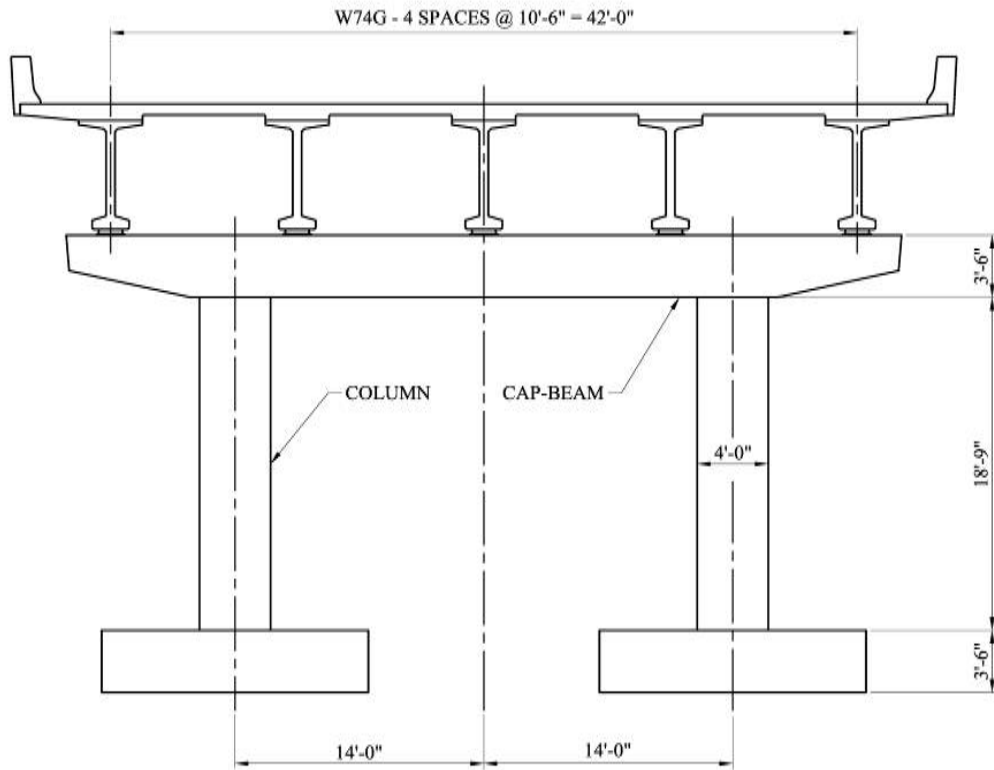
Typical Elevation of Reinforced Concrete Pier
